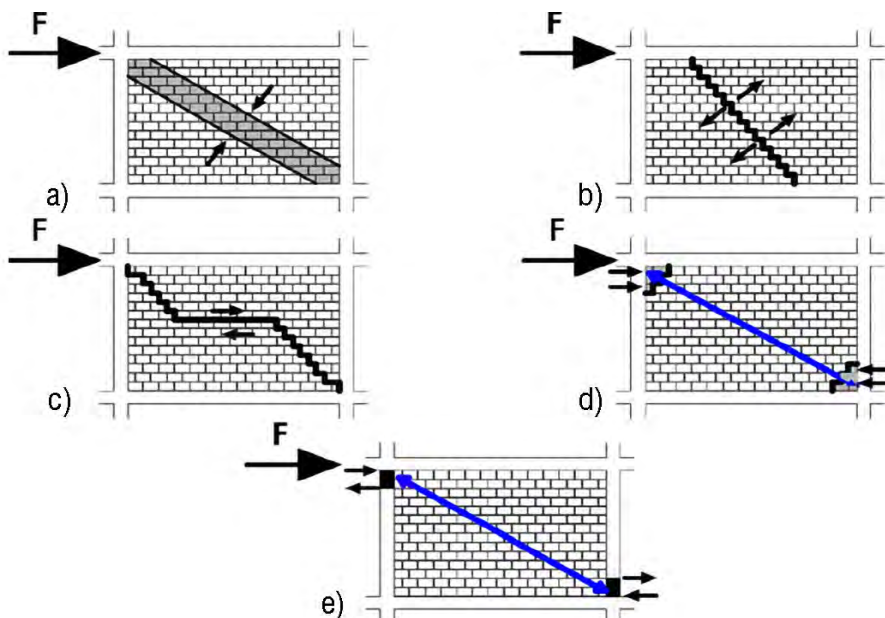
Possible failure mechanisms of infilled frames under IP seismic actions (F): a) diagonal compression failure; b) diagonal cracking failure; c) sliding shear failure; d) corner crushing failure; e) frame failure crushing. Source: (Ruggieri, 2018)
